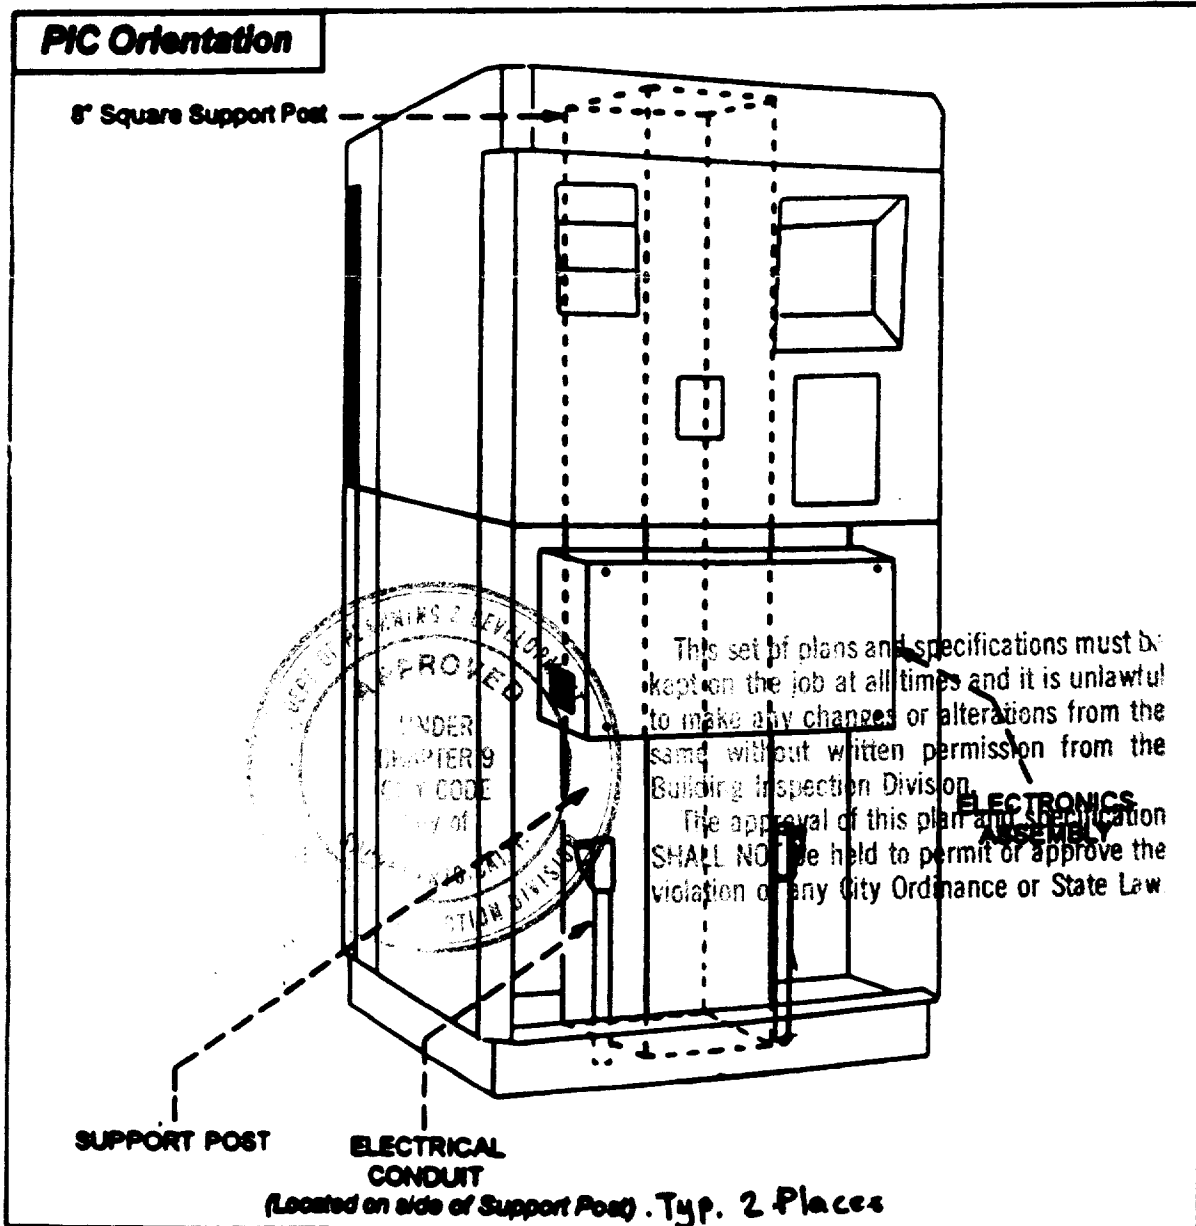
PIC Orientation (Support Post and Mounting wConduit Location)
